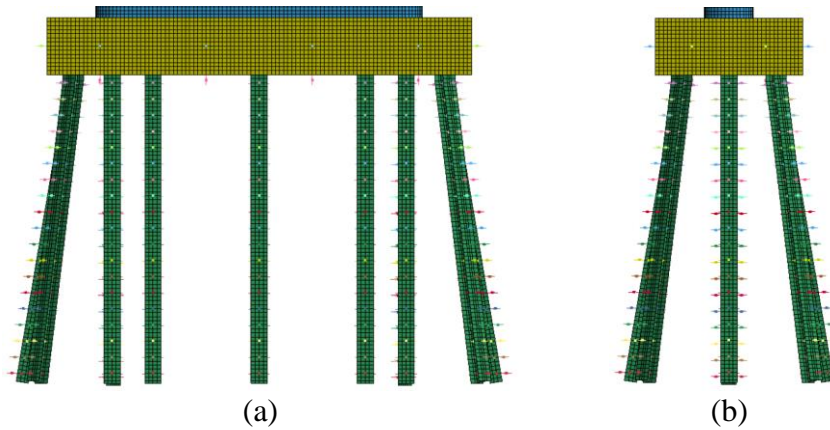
Details of the T-pier's deep foundation: (a) side view from the road and (b) view in column's longitudinal axis
